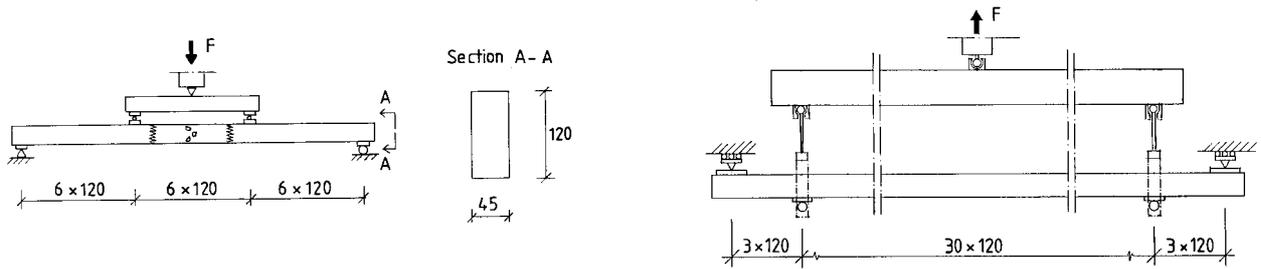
Left: Test arrangement for a single defect interval test piece which is finger jointed to stronger beam shafts. Right: Test arrangement for full uncut timber beams. All units are mm.
